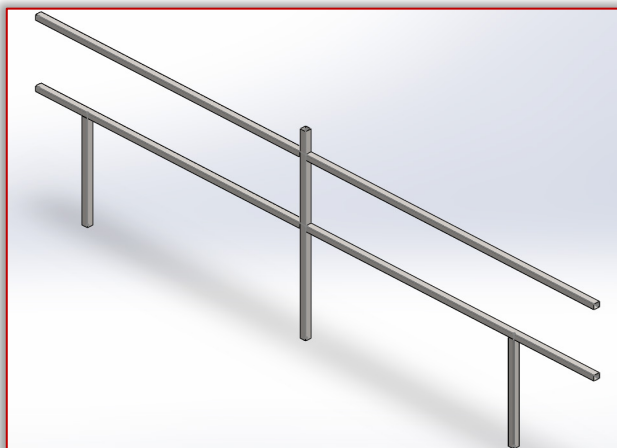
CAD model of 3D load-bearing substructure of facade "sandwich" panels [1]
